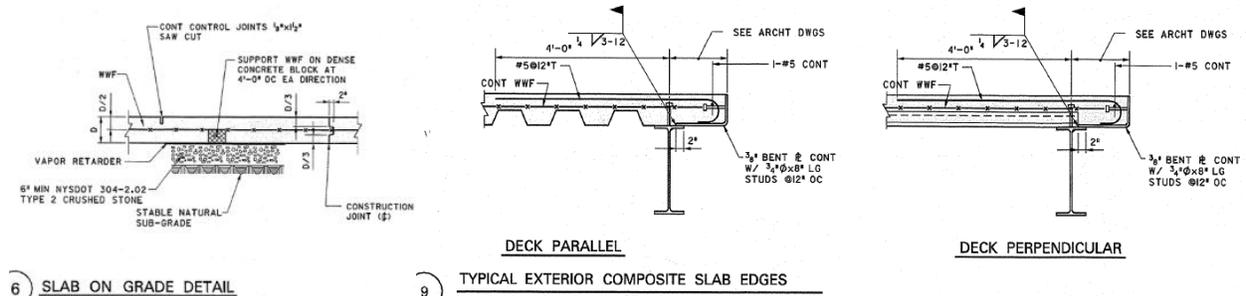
Typical composite slab details. Courtesy of RIT. Drawings not to scale.
